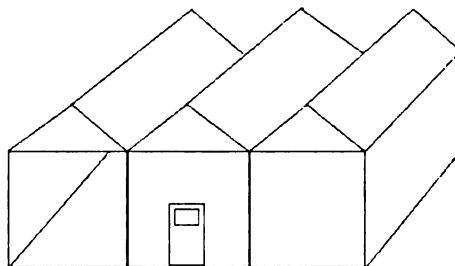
Ridge and furrow, or gutter-connected greenhouse
